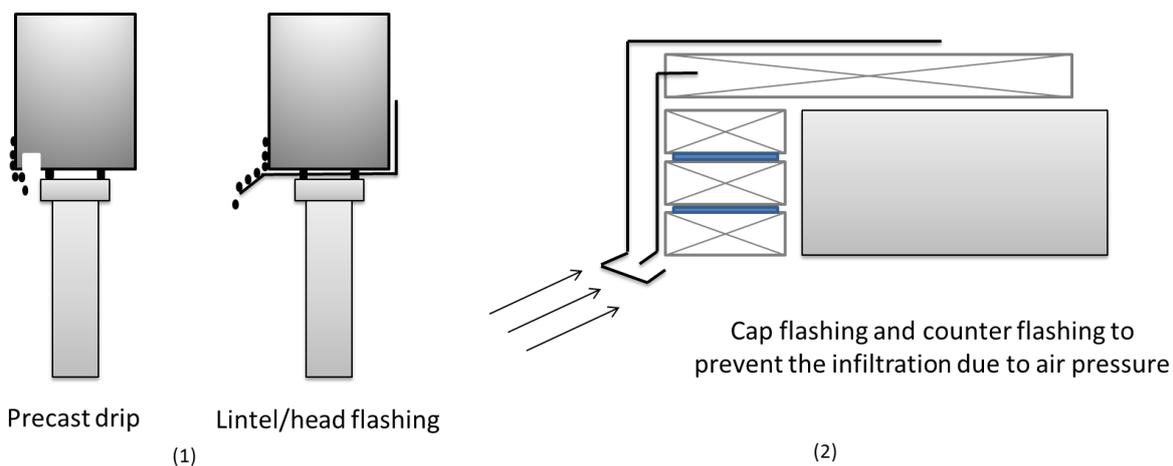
(1): Typical use of “drip edge” and flashing to prevent infiltration by surface tension - (2): Flashing to prevent water under pressure from entering the BE by wind/air current, adapted from M.T. Kubal (2008).
